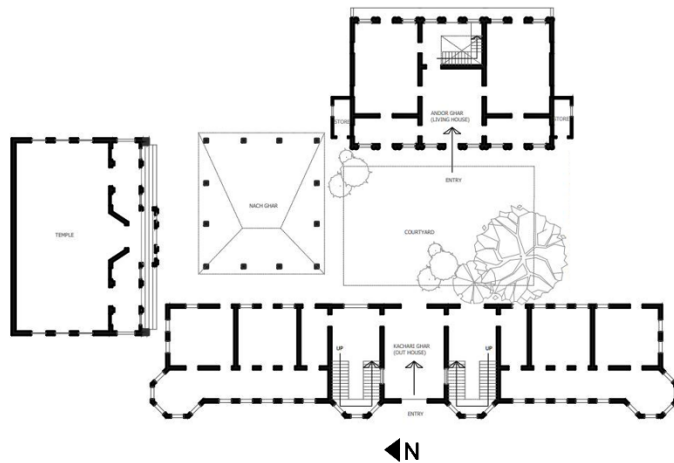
Ground Floor Plan of Andarmahal, Kachari House and Temple (Source: Author).
